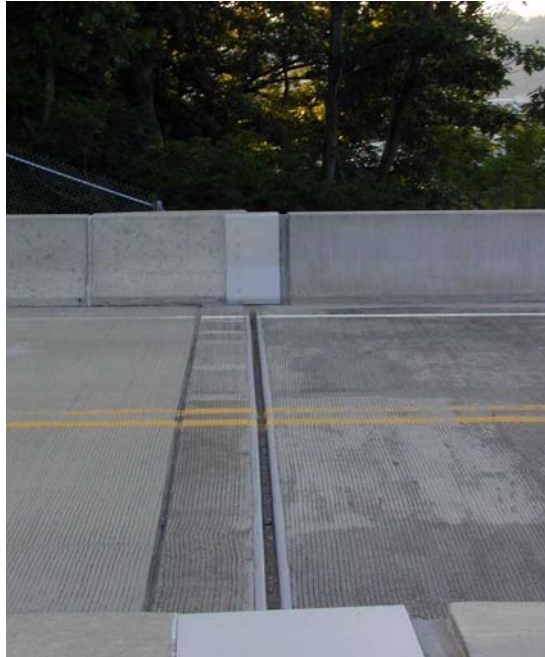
Strip Seal at North Abutment (typ.) – note minor debris accumulation
